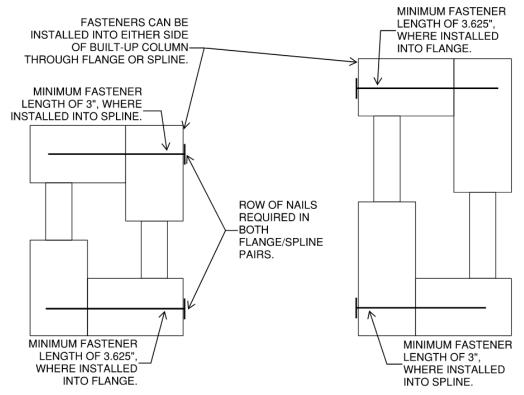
Fastening Requirements for BareNaked Tstud™ Built-Up Column with 2x3 Flange
